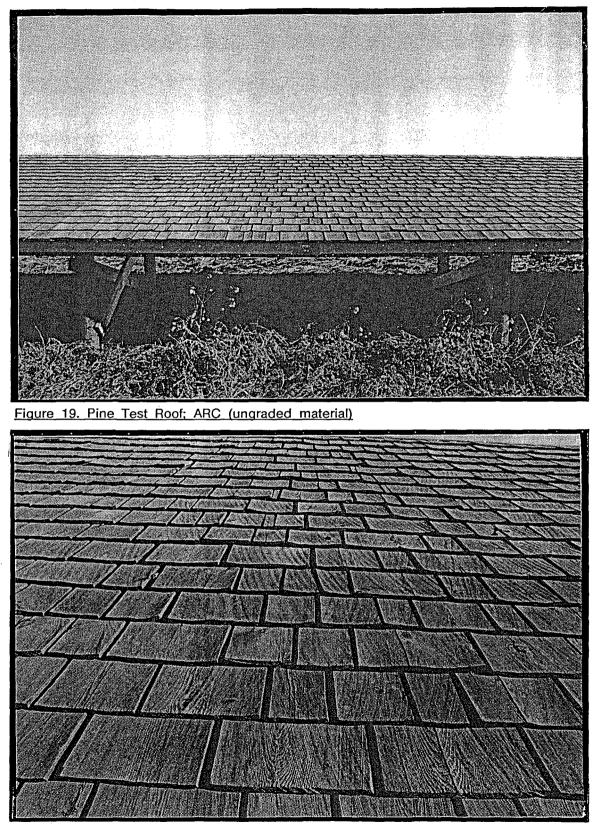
Pine Test Roof Close-up; Note Cracks and Flat Sawn Shingles
